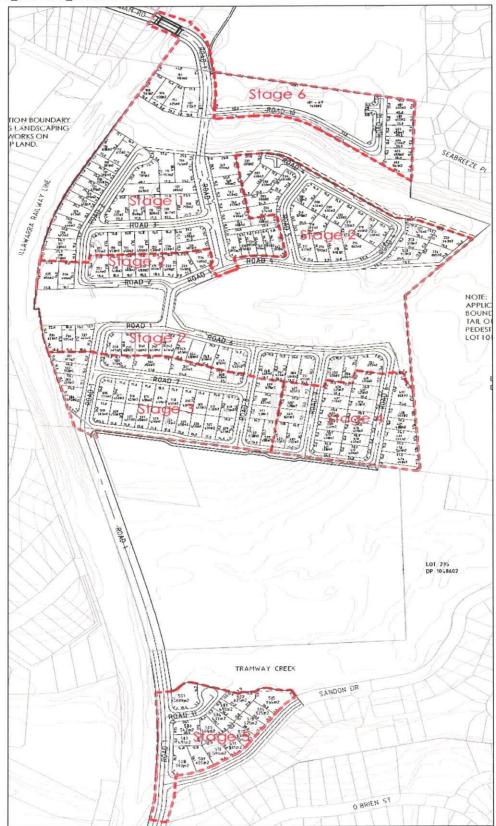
Extract of Proposed Subdivision Layout and Staging Plan
